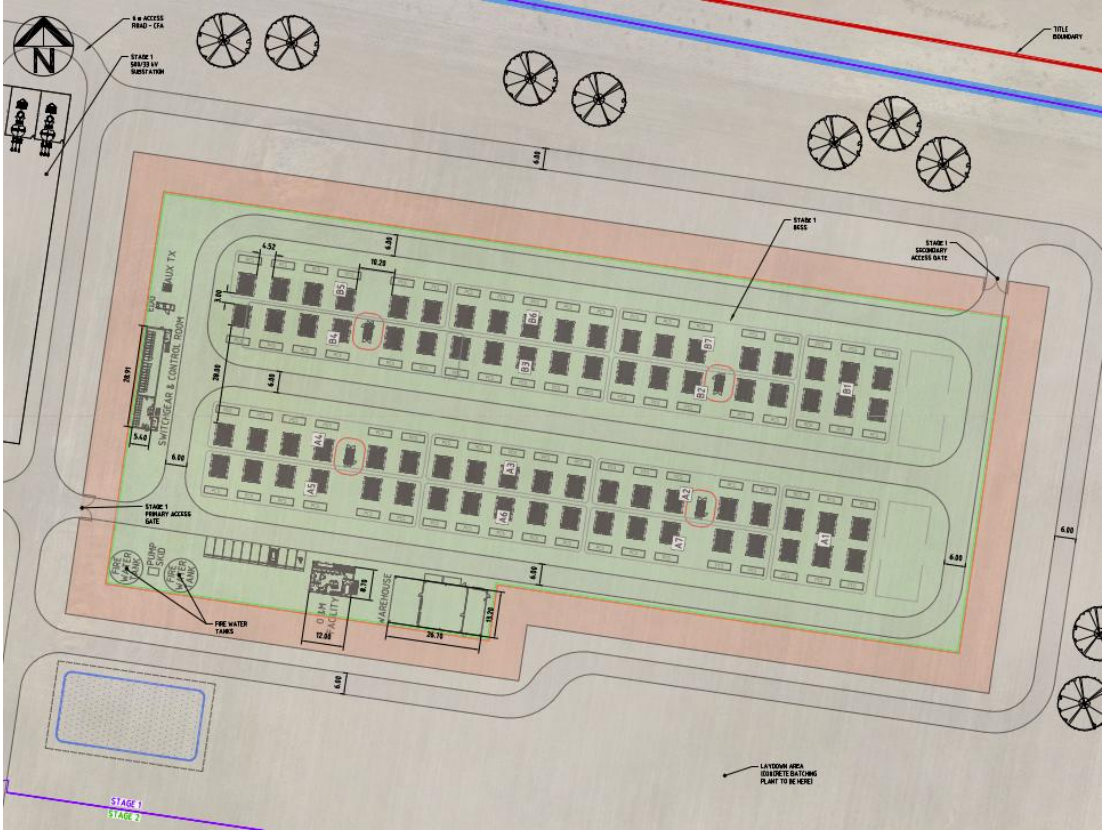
Proposed Stage 1 site plan detail. Source: Stage 1 Development plans.
